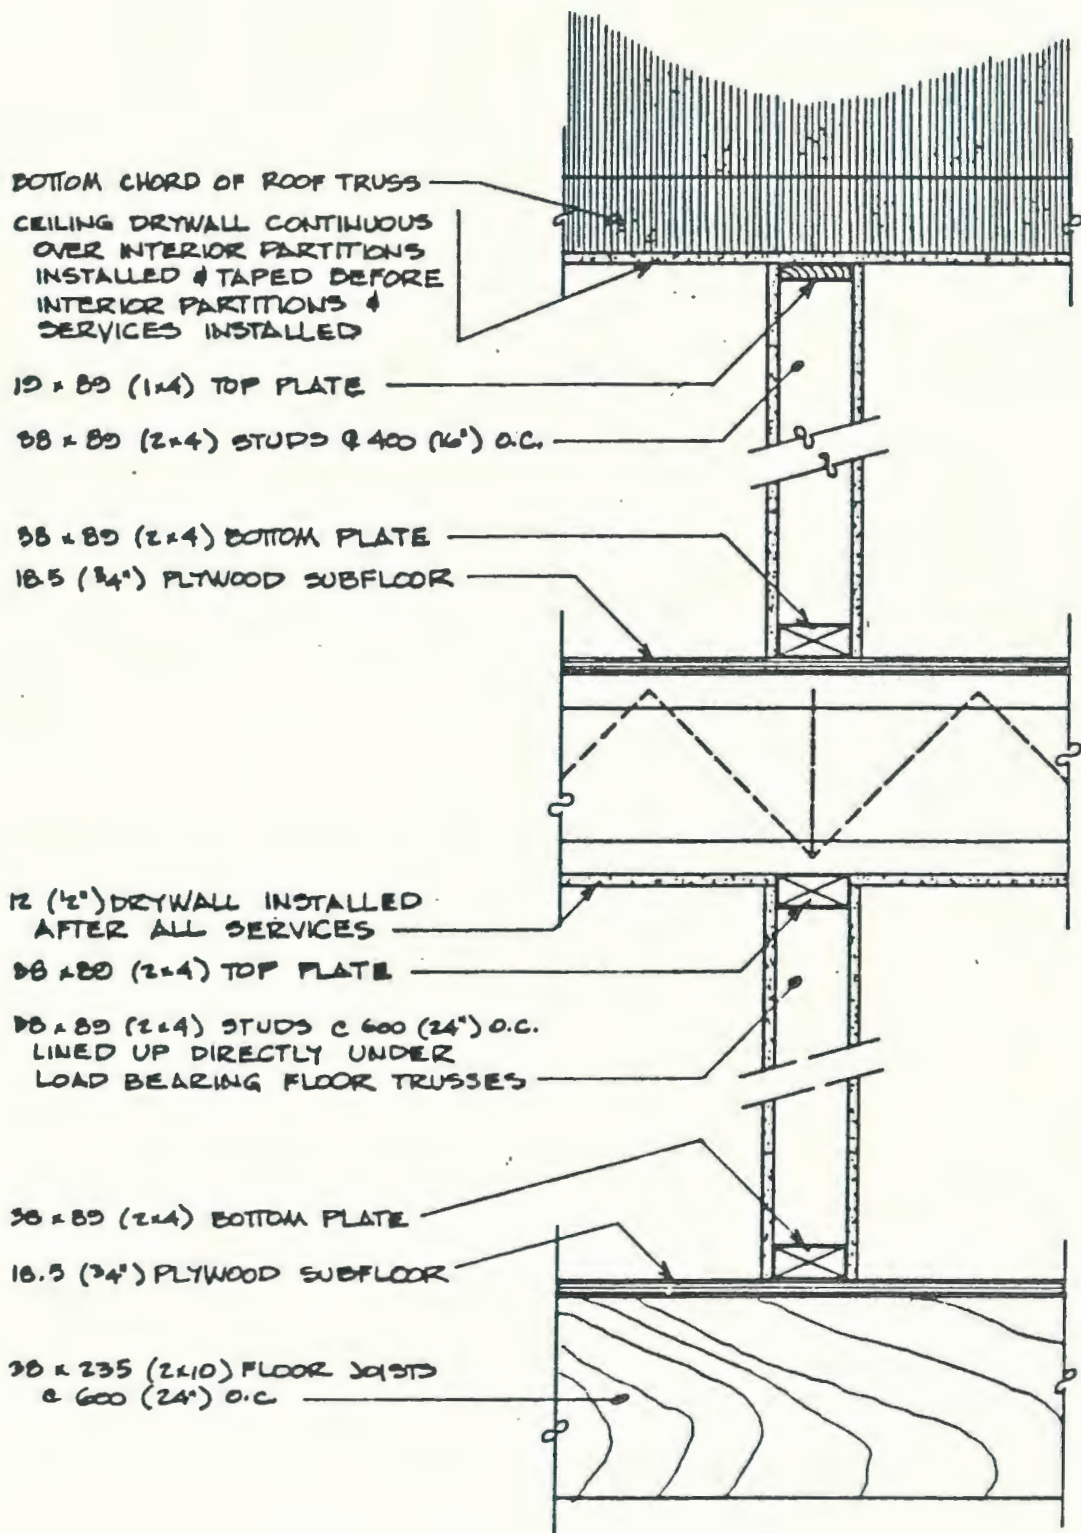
Interior Wall Details - Alberta Demonstration Project
